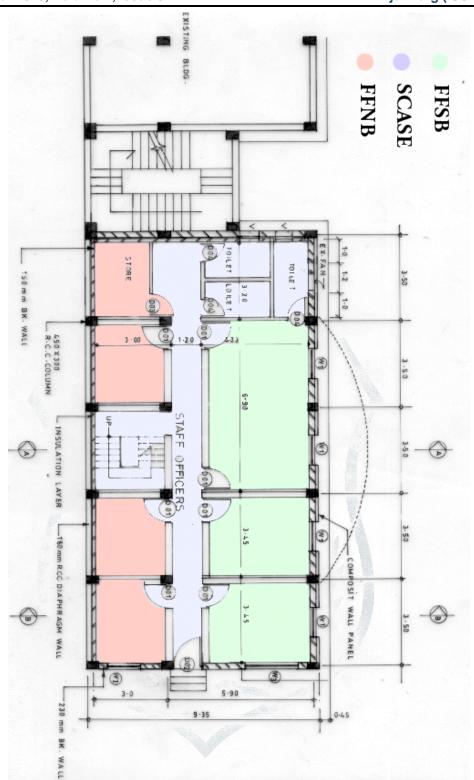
First Floor Plan, HIMURJA Office Building, Kasumpti, Shimla
